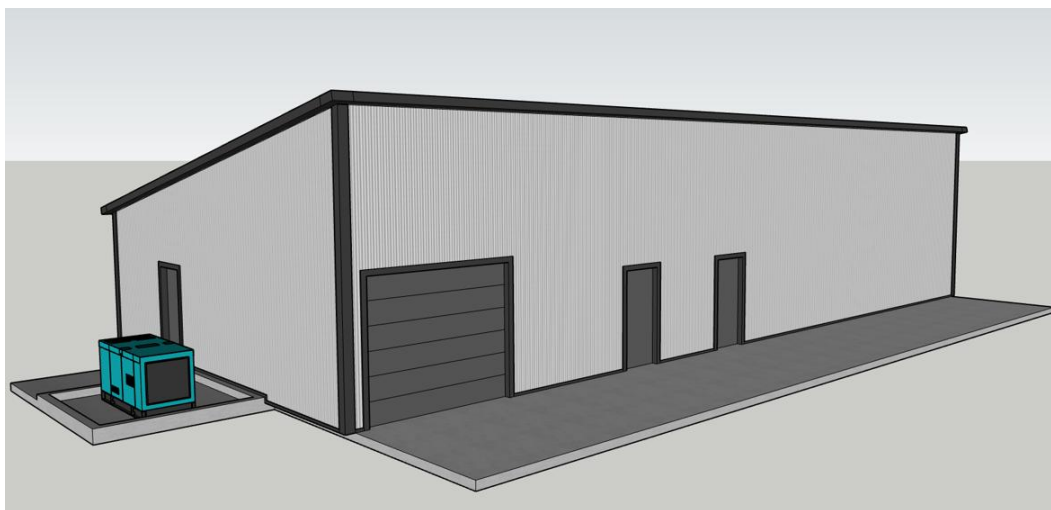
General depiction of the water treatment plant to be located at McNab Road site
